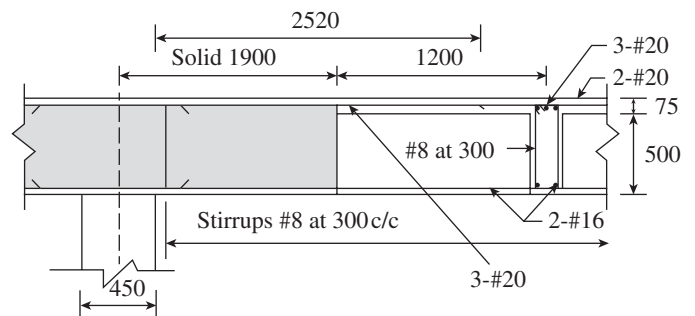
Reinforcement detail in the rib including shear reinforcement
